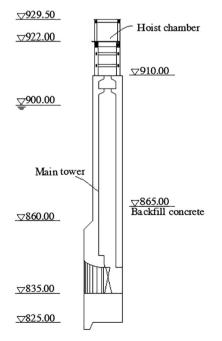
A typical section of the intake tower (elevations in m above sea level).
